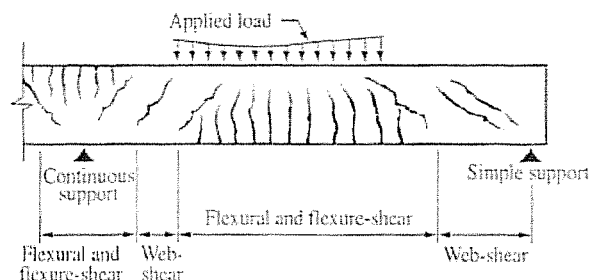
Types of cracking in concrete beams
